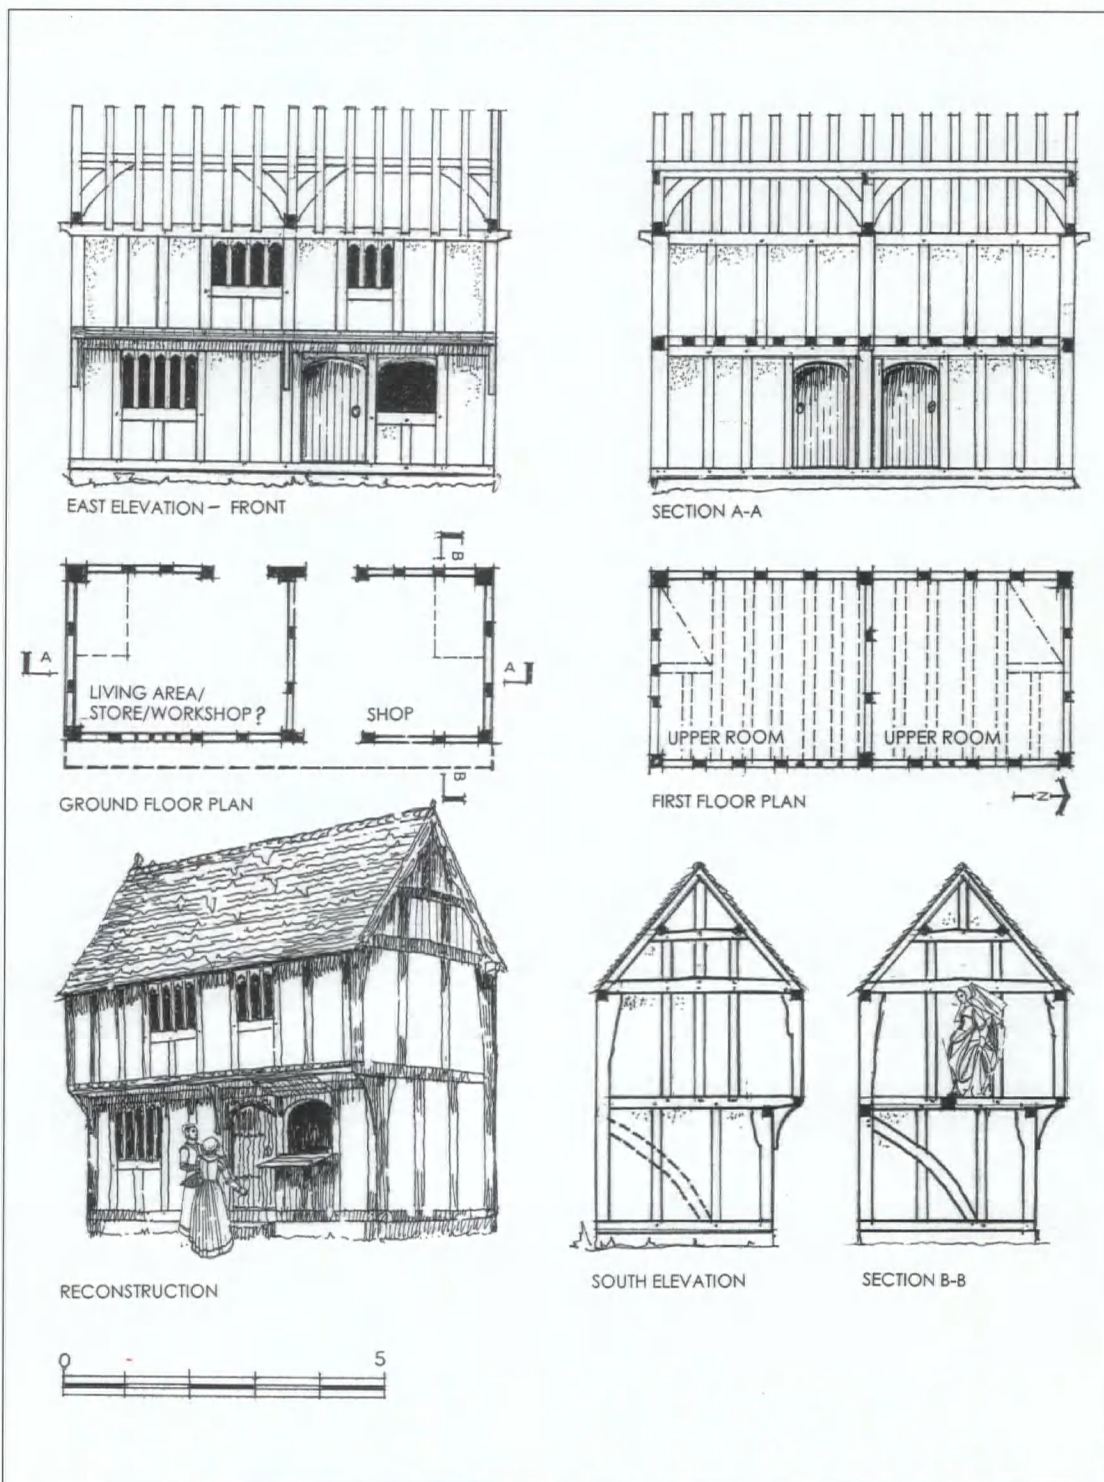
204 High Street Elstow - Reconstructed Plans and Elevations
